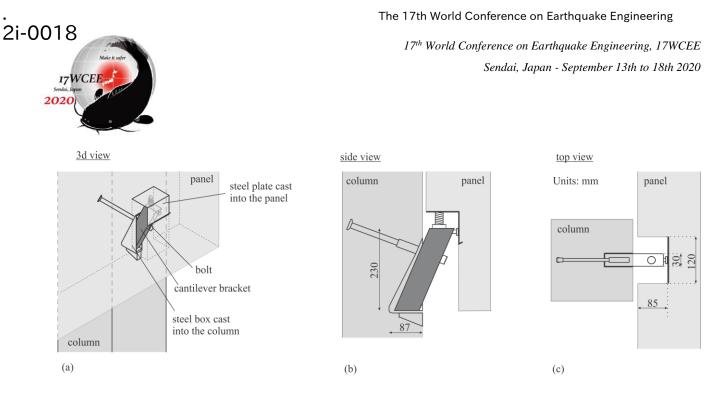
The assembly of the bottom cantilever connection: (a) 3D view, (b) side view, and (c) top view
